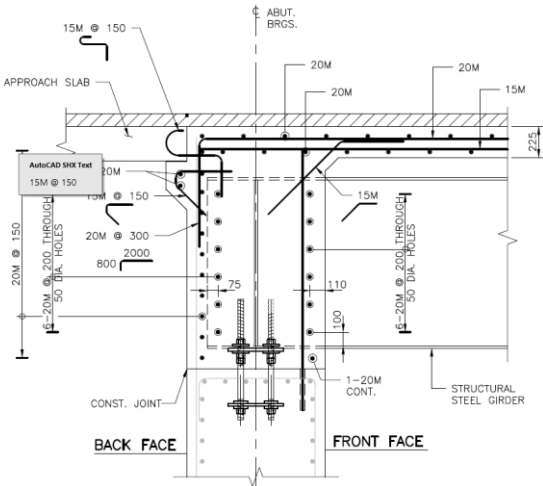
IAB connection where the girder extends close to the back face of the abutment, and horizontal dowels through the web (similar in behaviour to perfobond shear connectors) transfer the vertical force couple due to bending. Vertical anchor rods used to achieve even bearing in the concrete below the girder flange at the front face, and tolerance/adjustability during erection.
